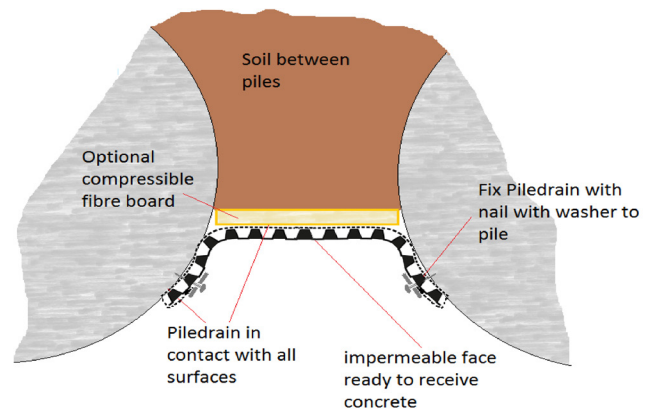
Piledrain fixed / nailed into concrete pile walls, ensuring each edge is in close contact with the piles.
